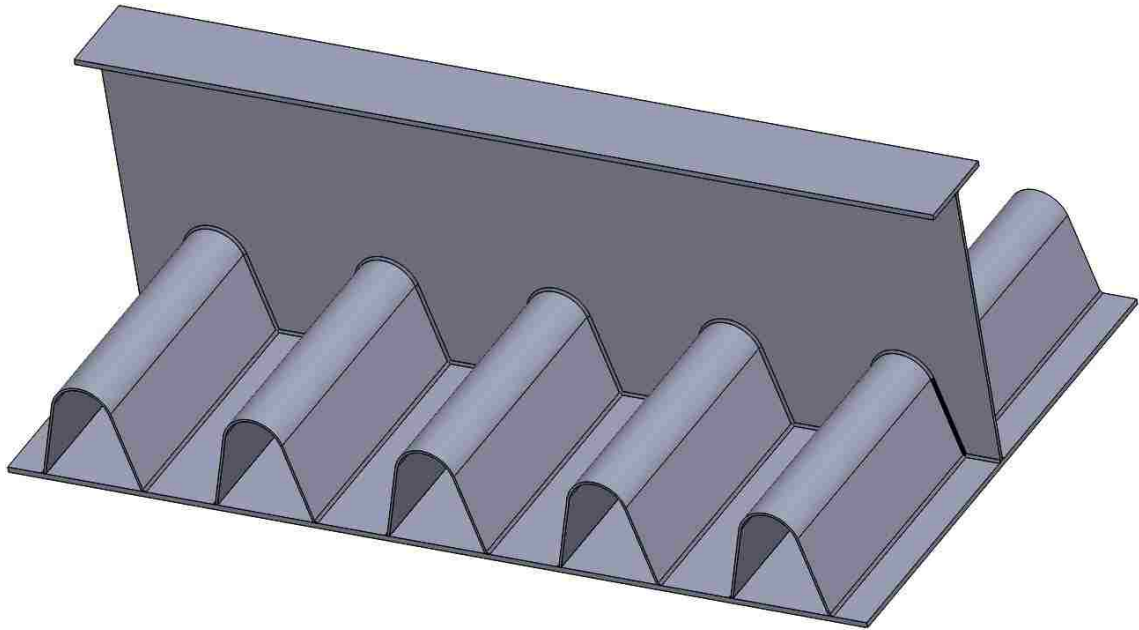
Assembly of floor beam, ribs, and deck plate in the inverted position
